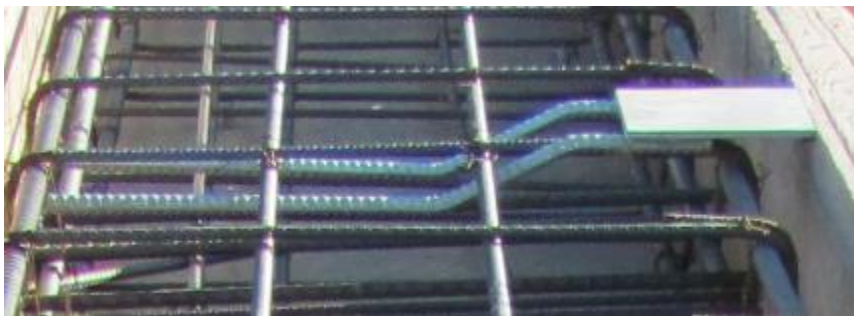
Detail showing joist bearing at wall; This is for a heavy joist load at a tall wall, with significant wind.
